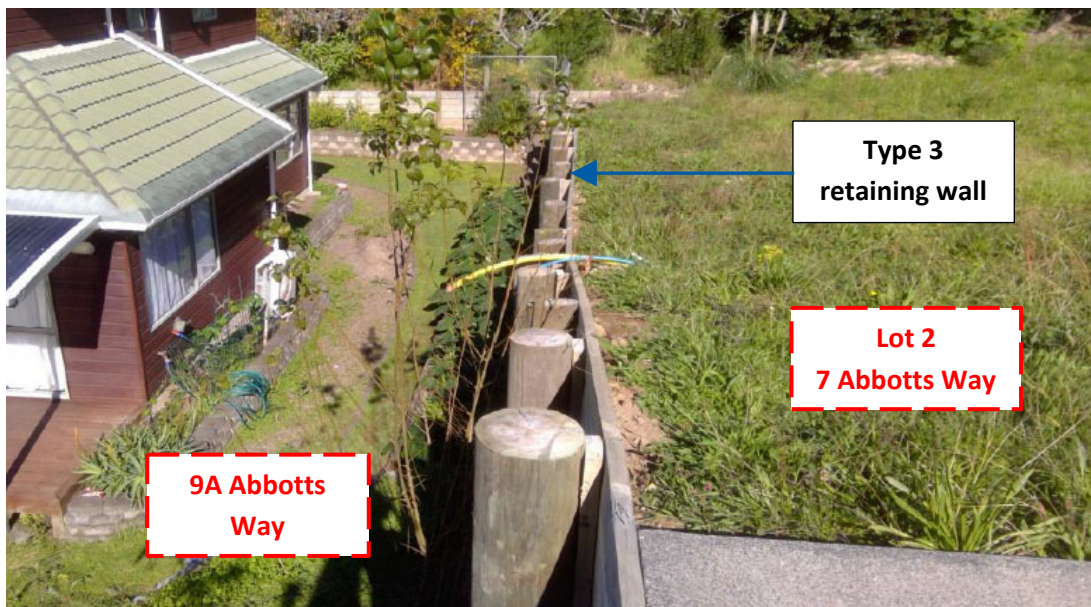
As-built Type 3 retaining wall as at 30 April 2021.⁴²
